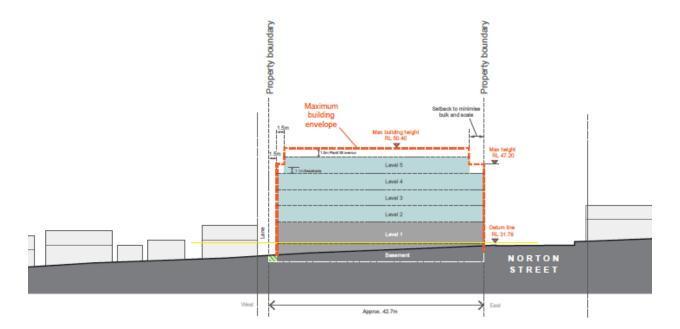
Building Heights and Massing Envelope - Section C (Carlisle St elevation)
